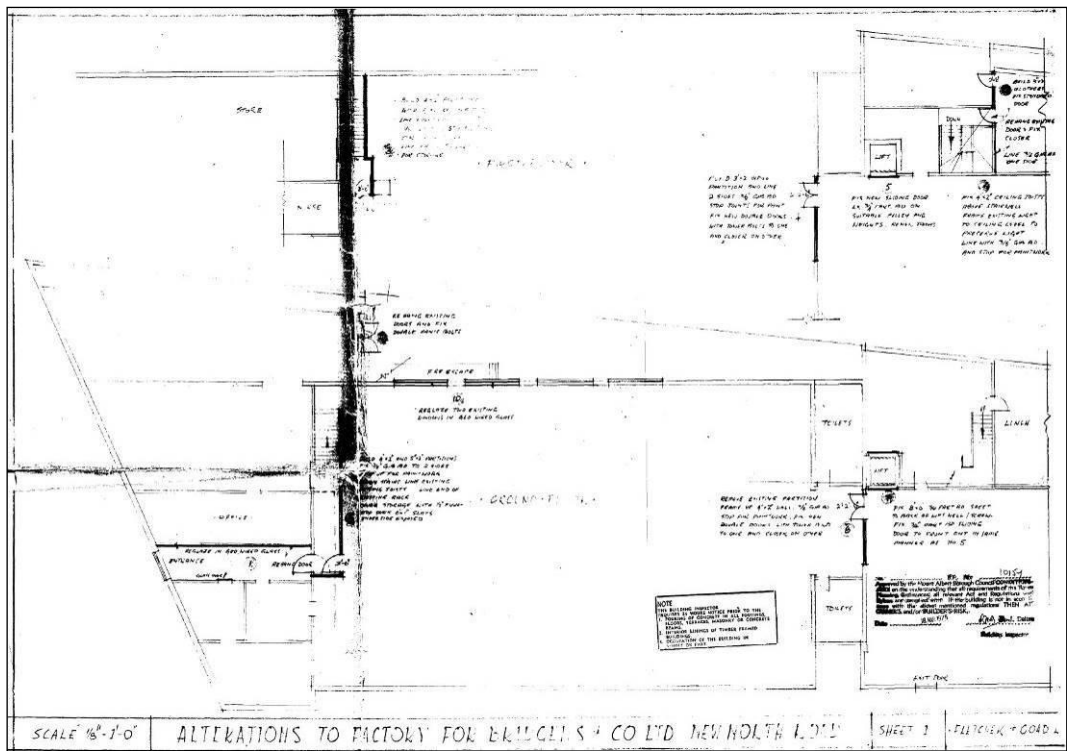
1975 Drawings for 'Alterations to Factory for Bridgens and Co Ltd New North Road' - by Fletcher and Goad: Plans. Internal alterations only. Auckland Council Filenet. Accessed October 2016.
